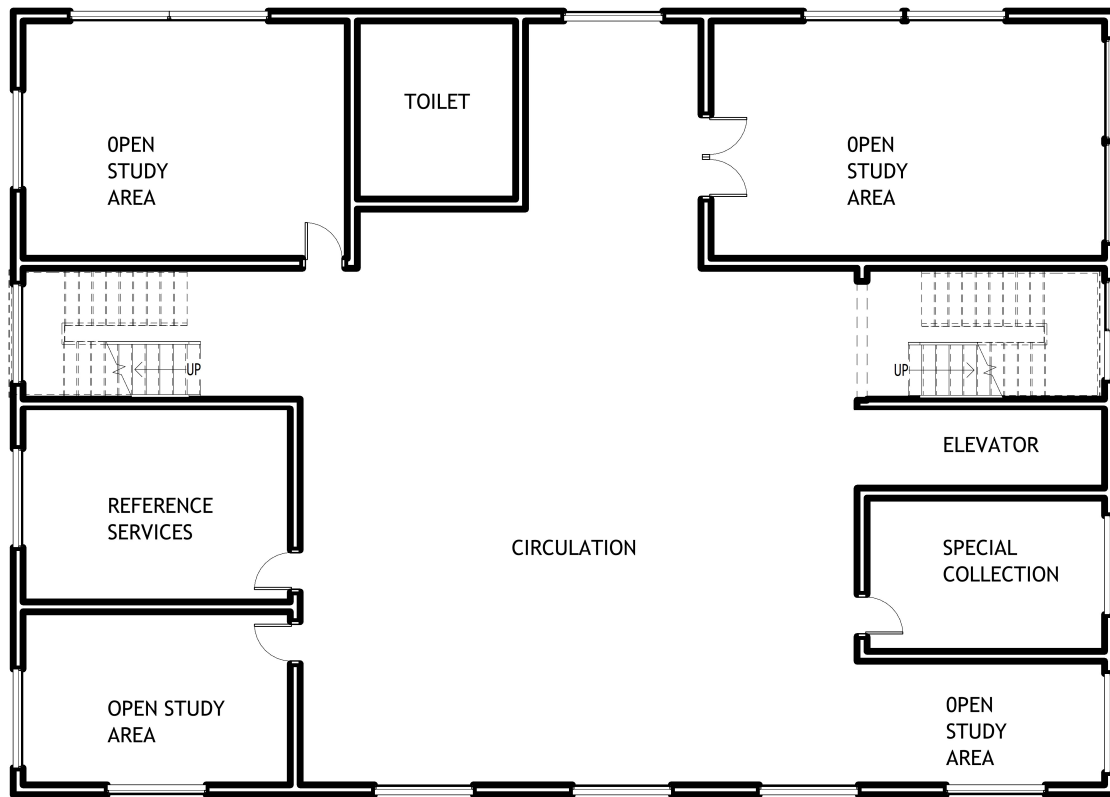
First floor plan of Delta State University (DELSU) (Source: Authors fieldwork)
